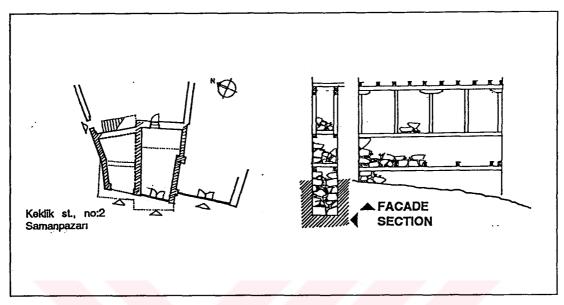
Use of Vertical Timber Elements in Masonry Ground Floor, the "Framed Masonry".
